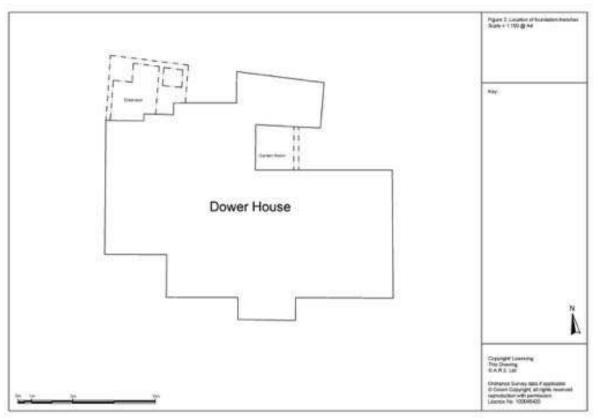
Location of footings for extensions at Dower House, Melbourne.
